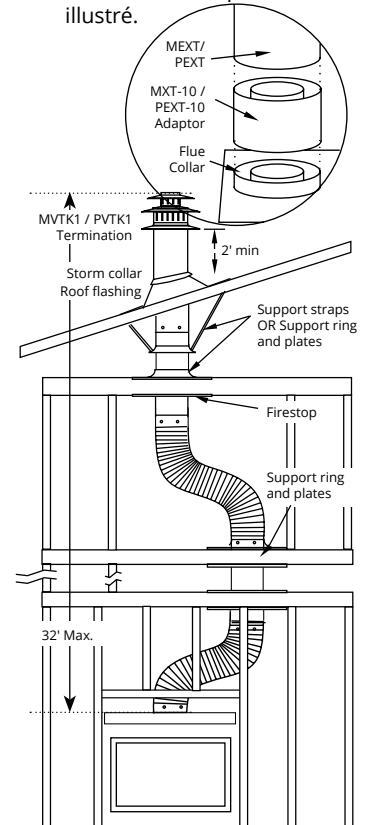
c Top vent, Roof mounted with 2 offsets (1 offset= two 90° bends).
